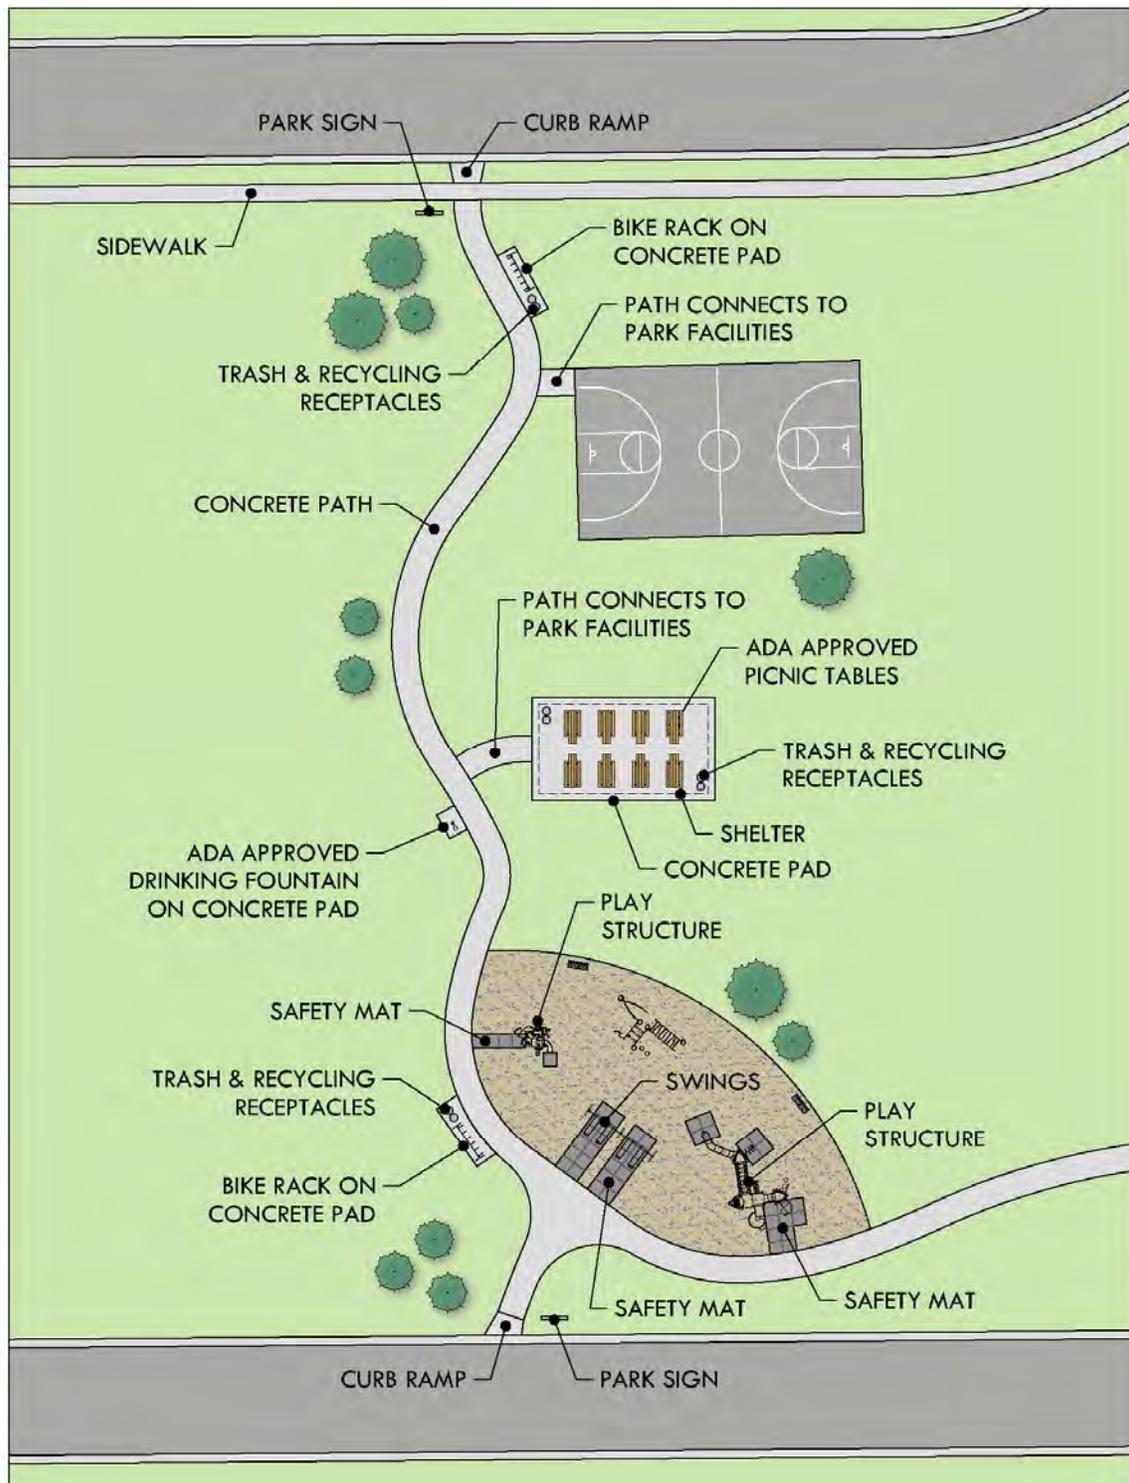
Typical ADA requirements call for barrier free access to all park facilities. Hardscape paths, playground safety mats and ADA approved support components are examples of good practices when designing parks for accessibility. Other examples of necessary elements for general park design include bicycle parking, trash/recycling receptacles and a park sign.
